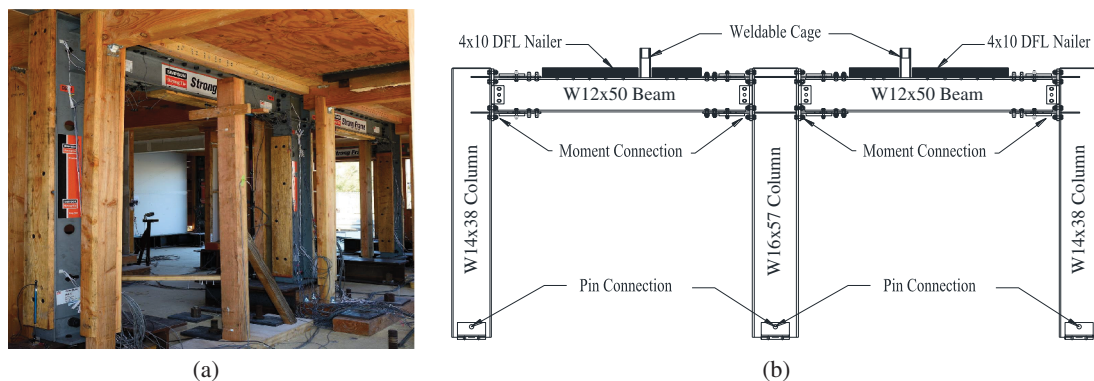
Steel SMF: (a) frame installed in first story; (b) elevation views and design details
